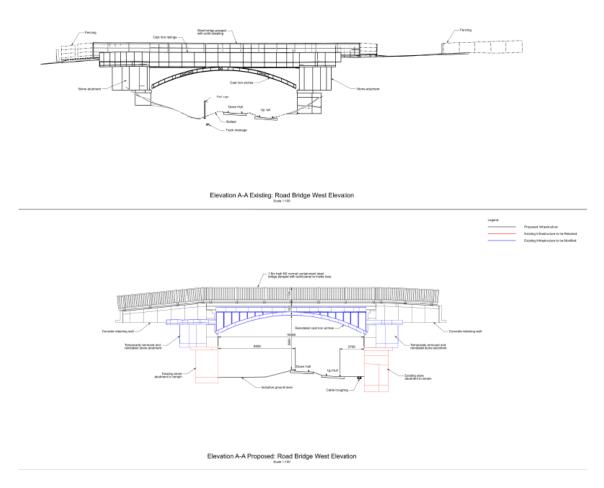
Existing and proposed elevations – Crawshaw Woods Bridge.
